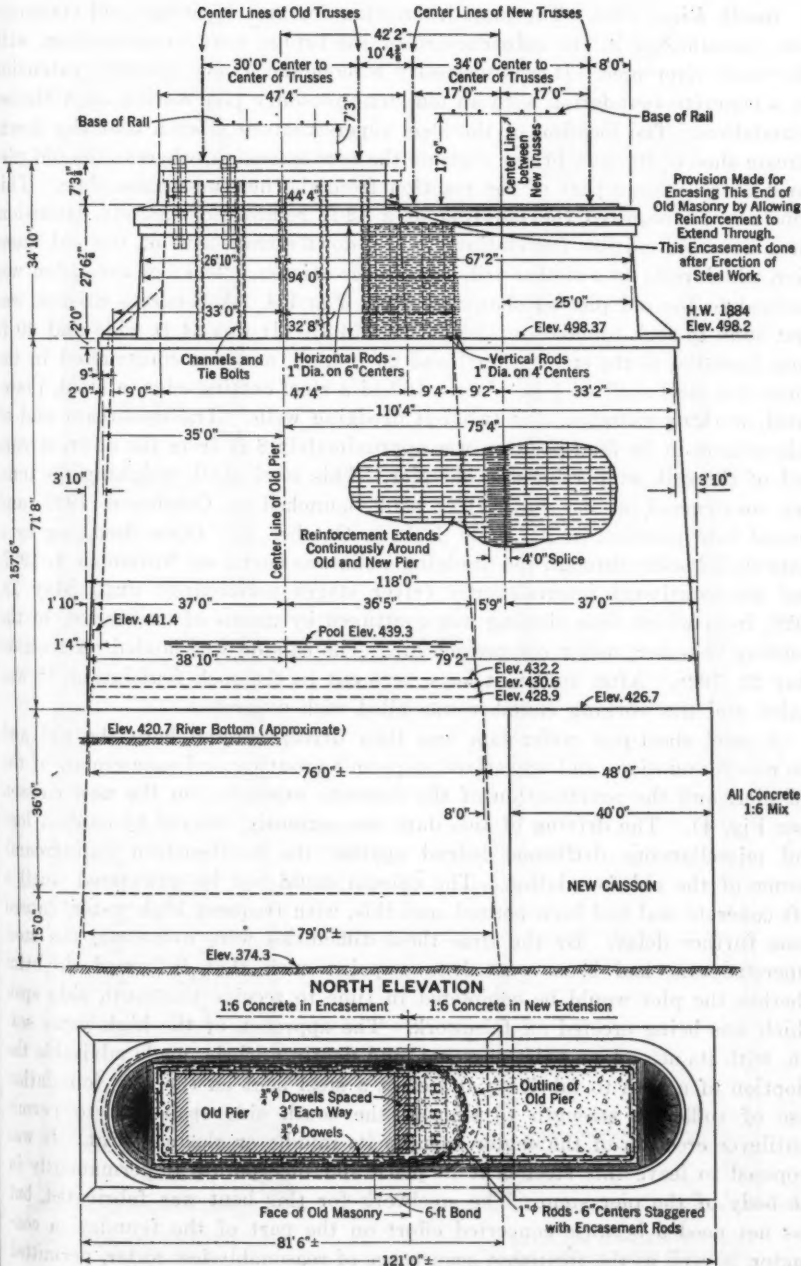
DETAILS OF SOUTH SHORE PIER
